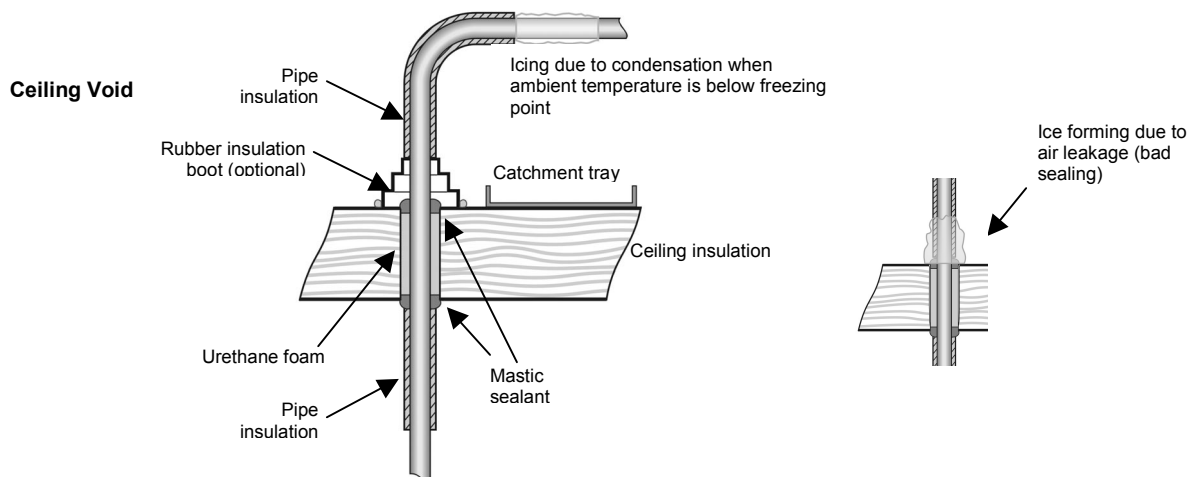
Sealing Holes Through Refrigerated Storage Ceiling or Wall
